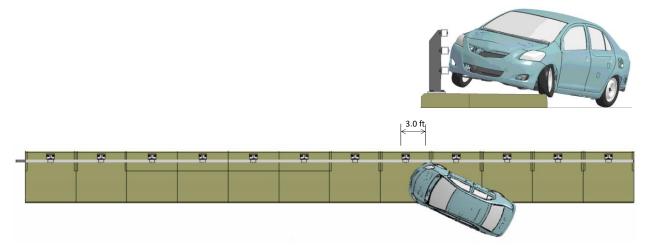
Impact point with bridge rail for Test 4-10 on the sidewalk-mounted S3-TL4.
